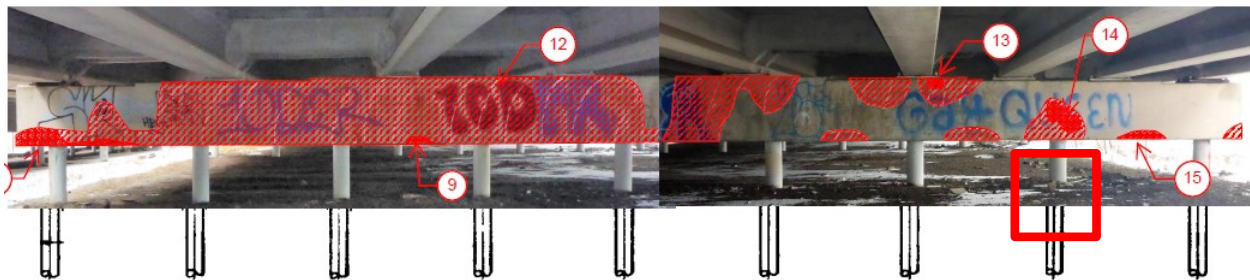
Pier 12WB mapping diagrams (photo taken in 2018)
